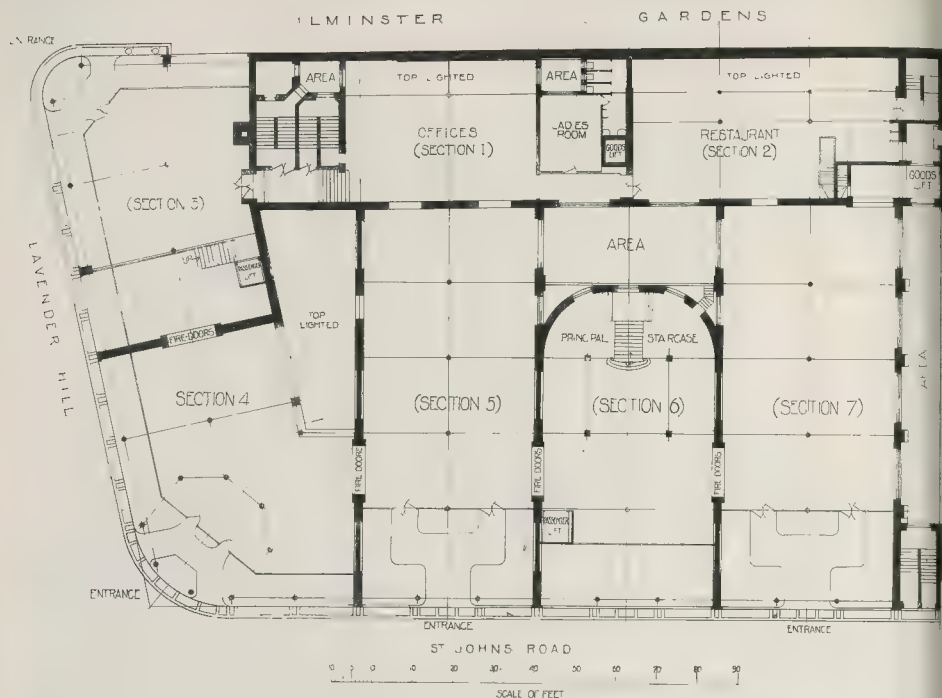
New Premises for Messrs. Arding & Hobbs, Clapham Junction: Ground Floor Plan.
